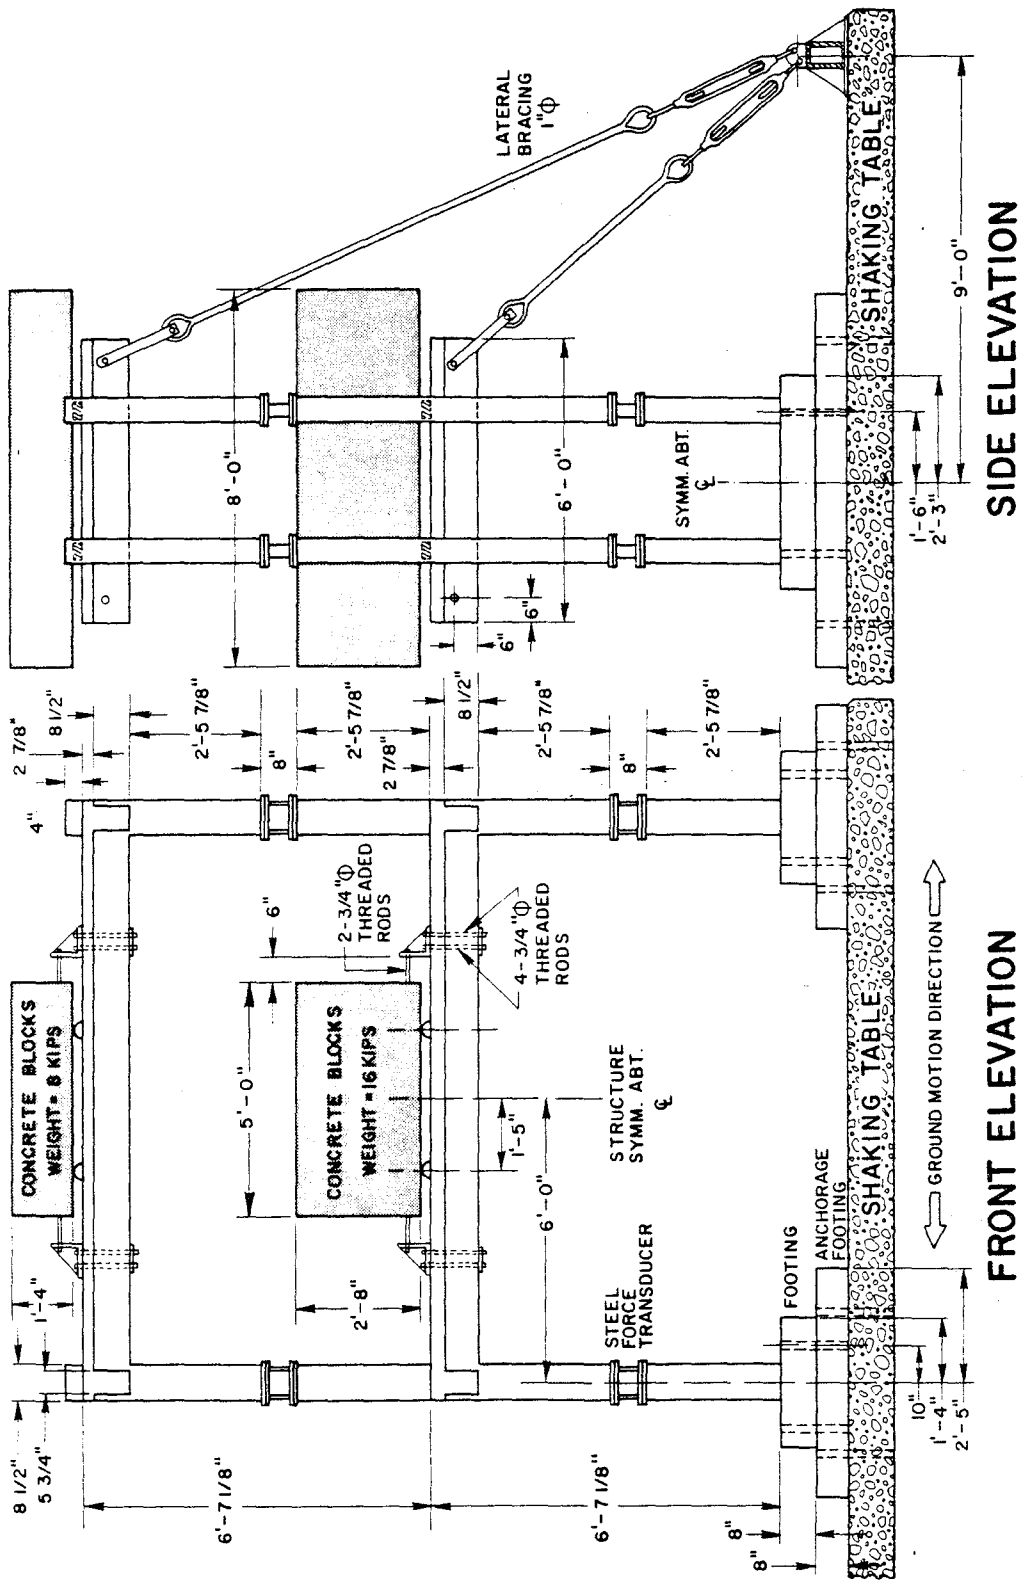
TEST STRUCTURE AND TEST ARRANGEMENT ON SHAKING TABLE
